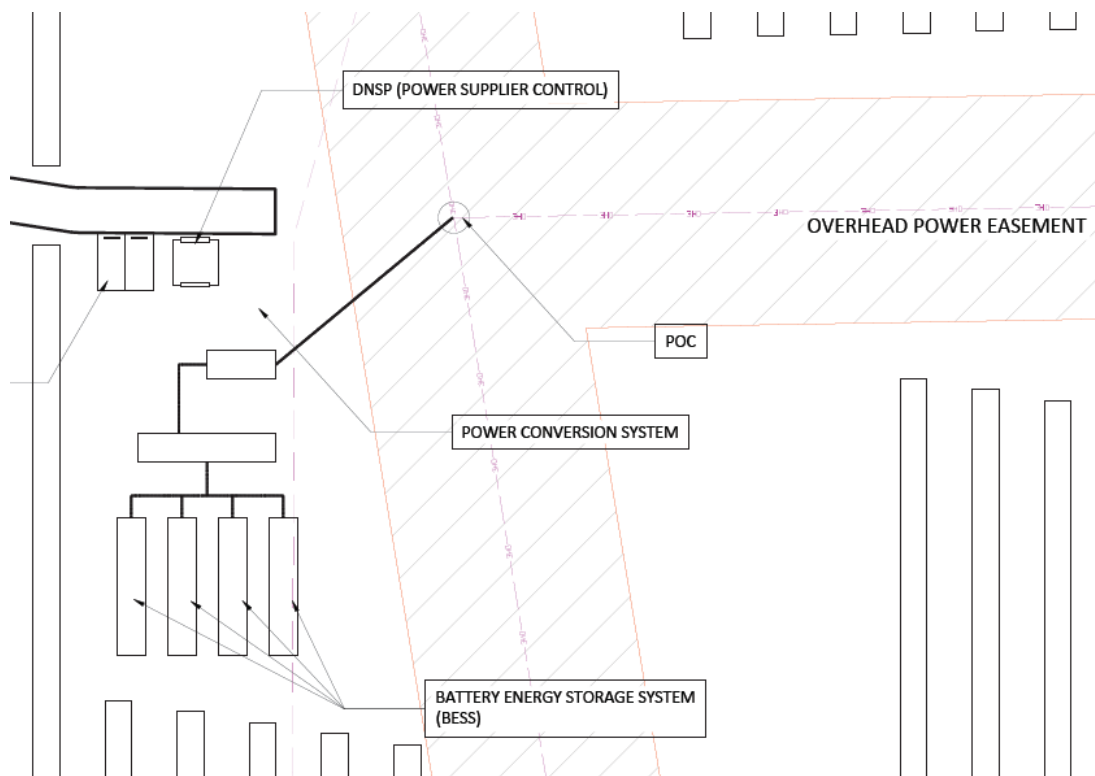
Concept layout of proposed substation area and proposed point of connection
